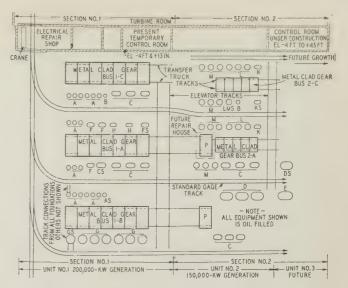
Plan of switch yard for units No. 1 and No. 2
